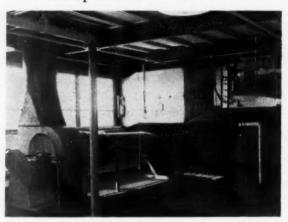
Horizontal main constructed of furan plastics. Branches provided are for connections to future equipment
